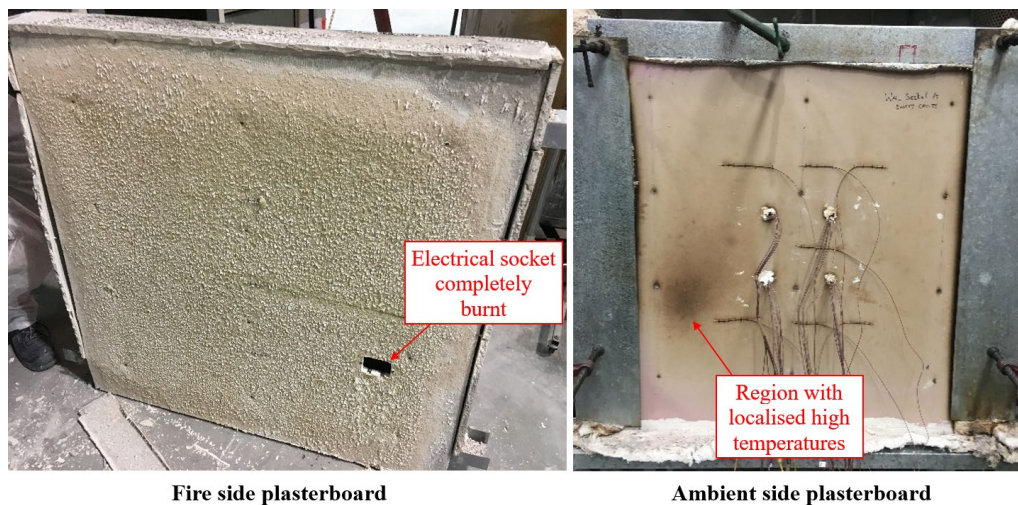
Small-scale wall test specimen with electrical socket after the fire test.
